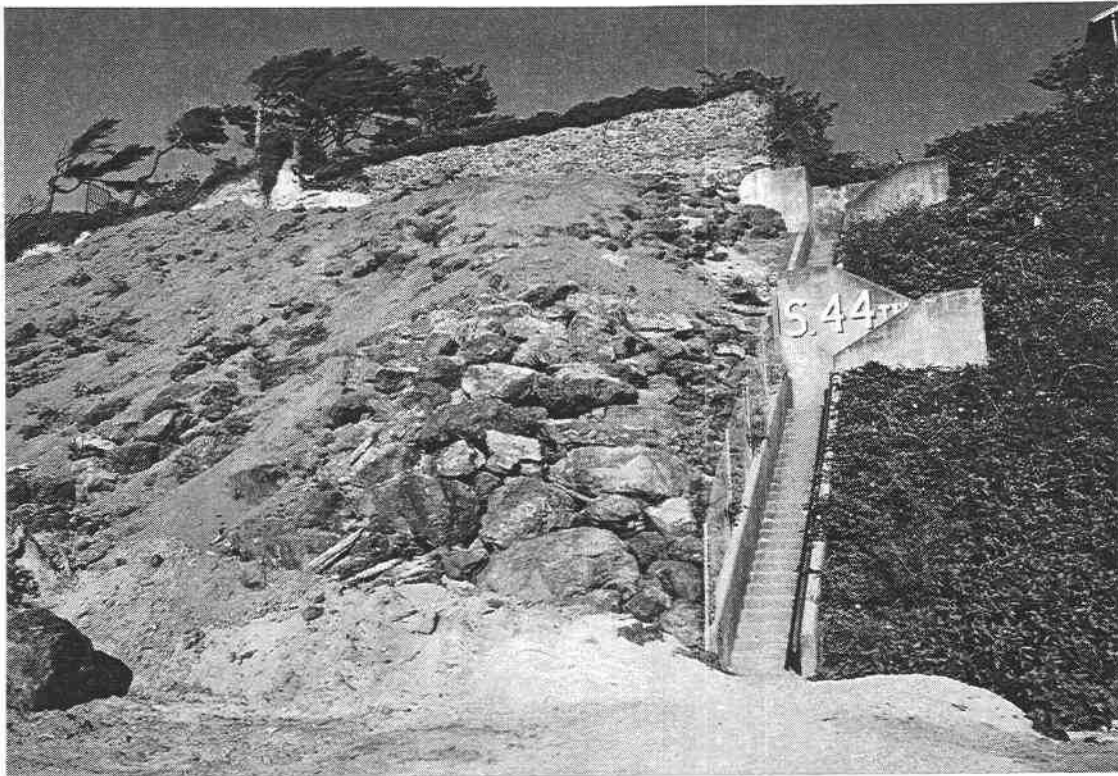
The Furman riprap revetment at S. 44th St. in Lincoln City is an extreme case of an over-designed structure.
